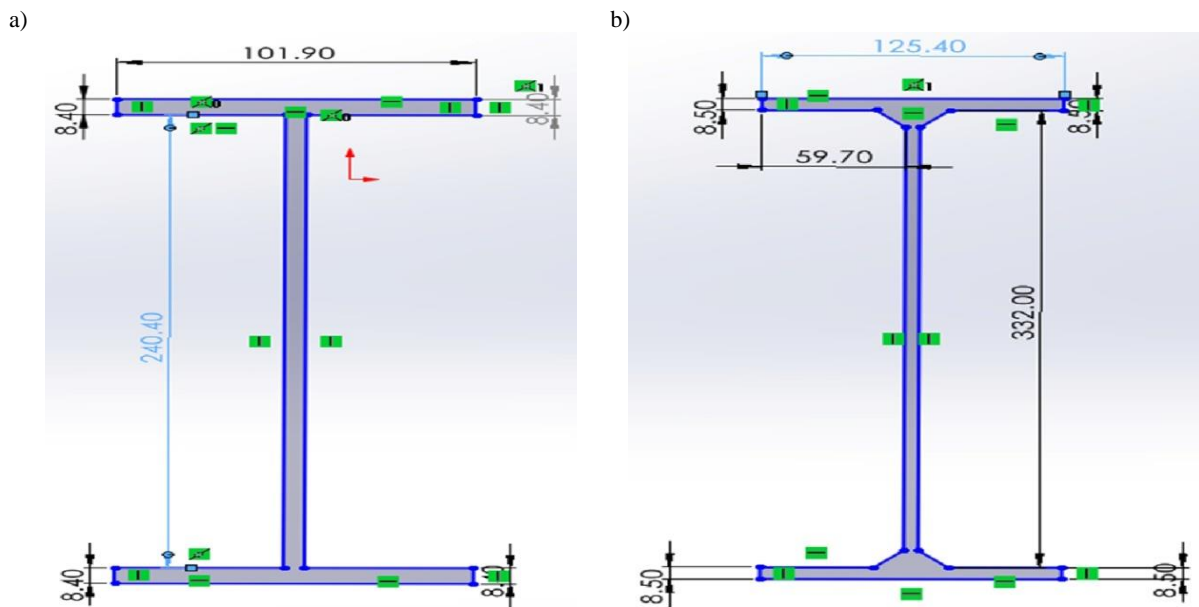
a) steel beam cross section (UB 254×102×25) and b) steel column cross section (UB 356×137×33).
